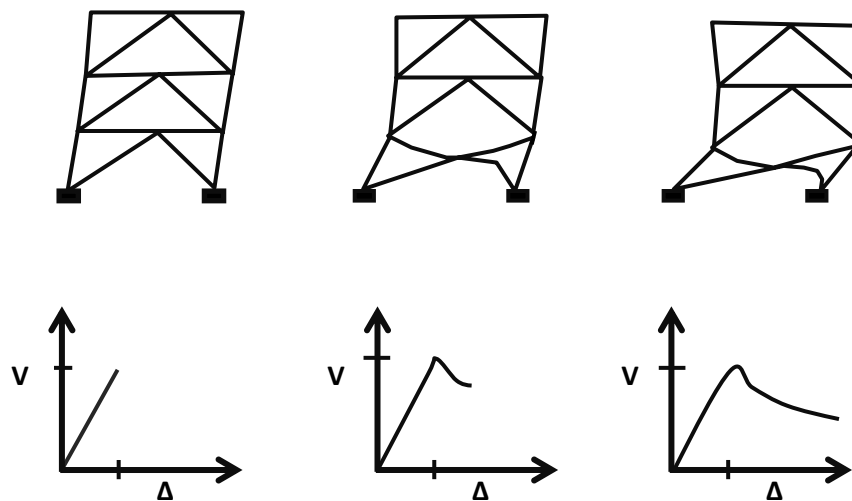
Chevron braced frame configuration and its failure mechanism
